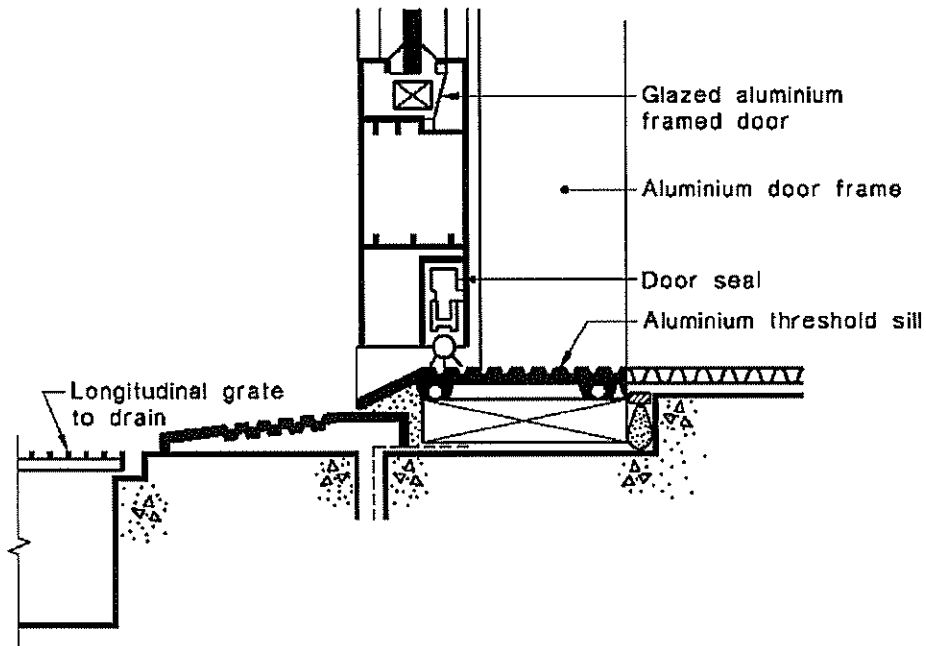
EXAMPLE OF ADAPTABLE HOUSE DESIGN
